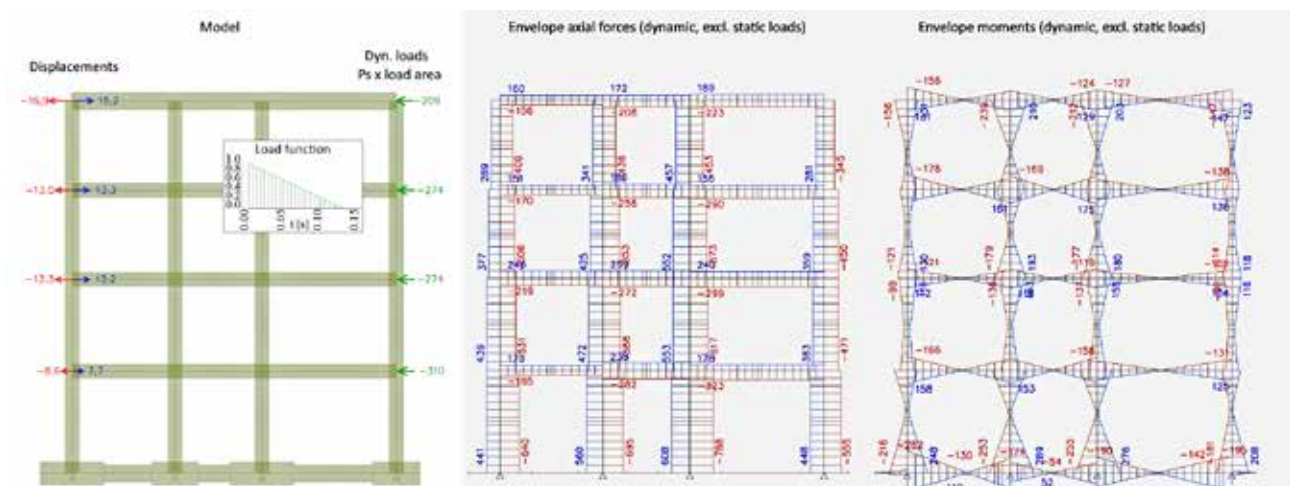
Results of the unbraced concrete frame subjected to blast loads
